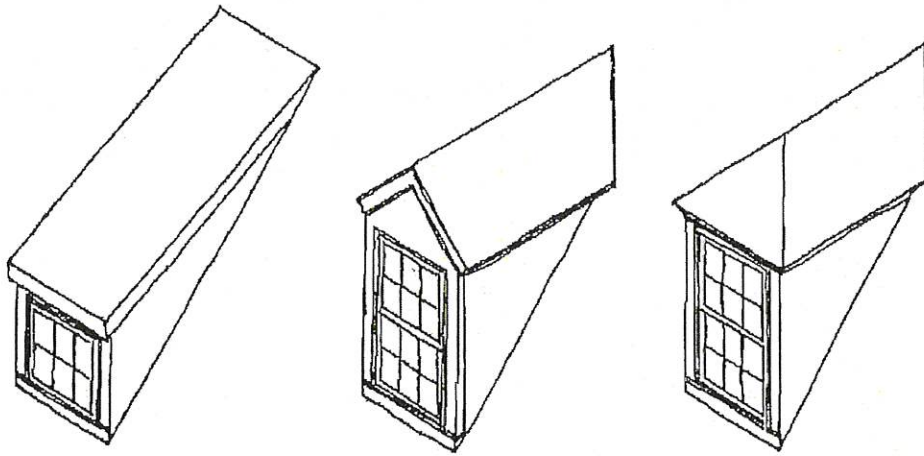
Dormer design proportions and placement on building additions and new building should be compatible in size, scale, proportions and detail with historic dormer forms found in the historic district. Left to right: shed dormer, gabled dormer, hipped dormer.
